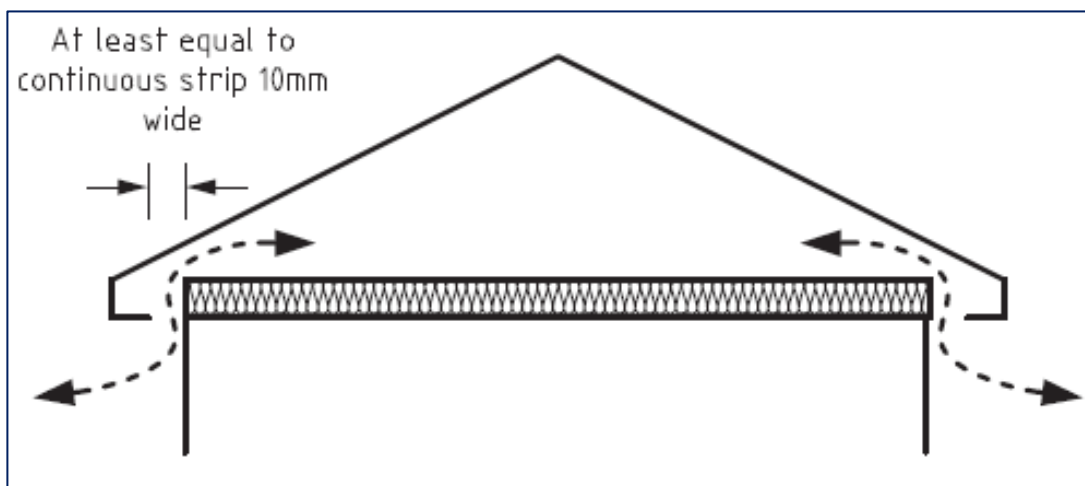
Typical Ventilation setup for Insulation Installed at Eaves Level
